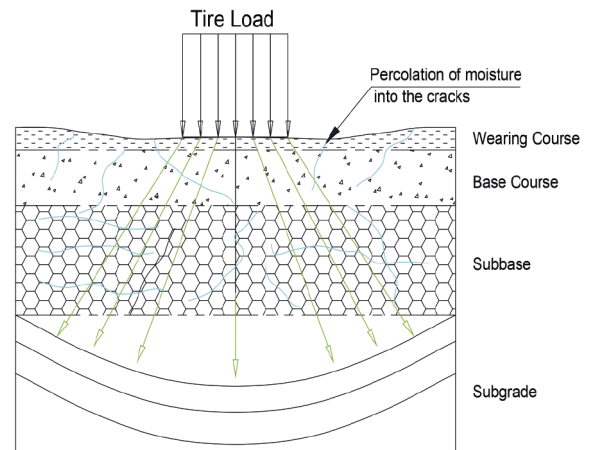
Cross section of pavement with crack propagation at subgrade failure under traffic cyclic loading [2]
